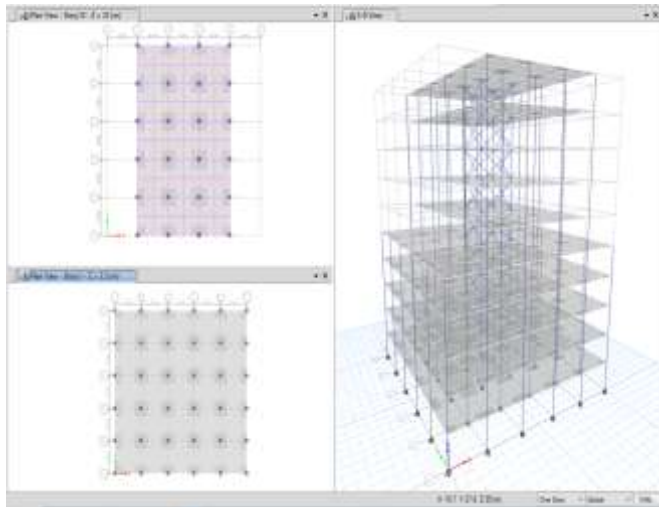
MODEL-C2 GEOMETRIC IRREGULARITY-FLAT SLAB BUILDING WITH BRACINGS
